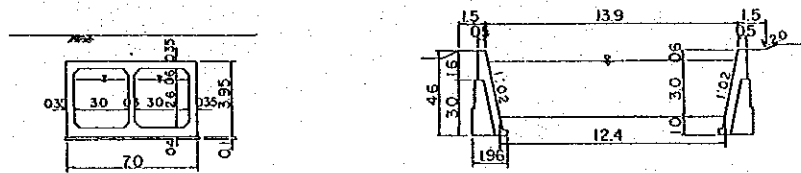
DRAINAGE SYSTEM PLAN OUT OF ROAD NETWORK
